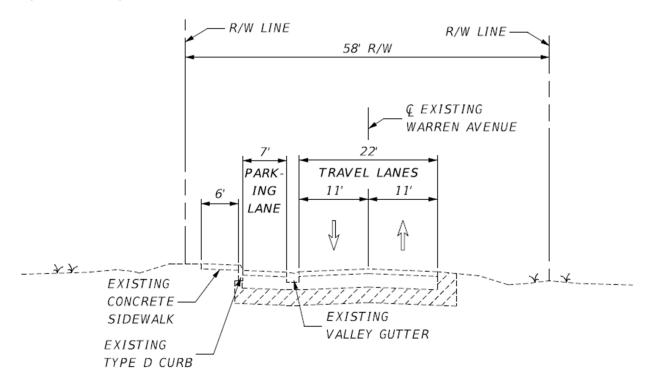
Existing Typical Section from 680 ft West of Milwee Street to Milwee Street
